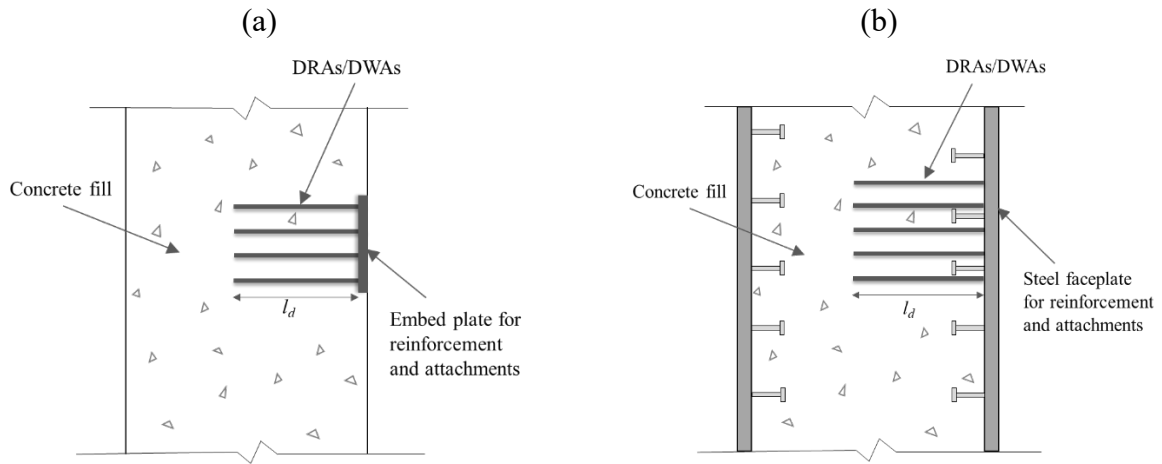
Anchorage assembly for (a) Reinforced Concrete walls, and (b) Steel plate Composite walls in safety-related structures, (redrawn from (Chicchi et al., 2020))
